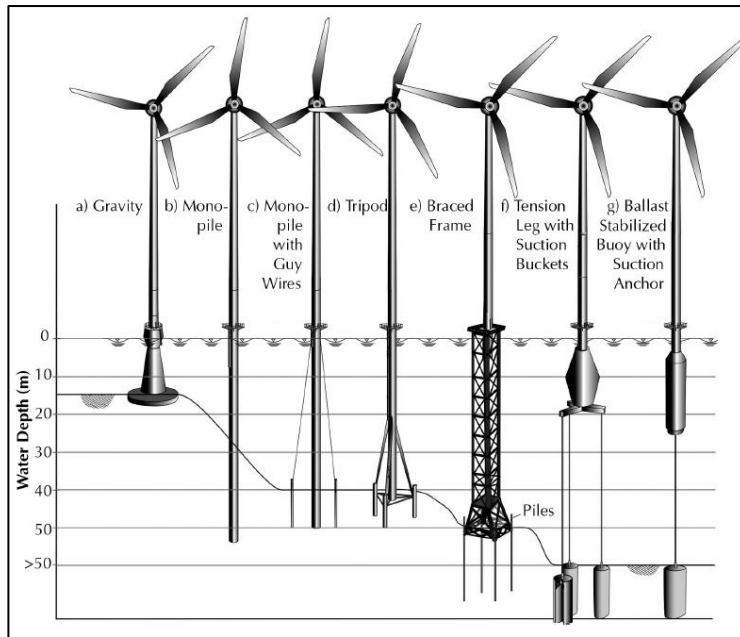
Different types of supporting structures, foundation type changes with water depth (Malhotra, 2011).
